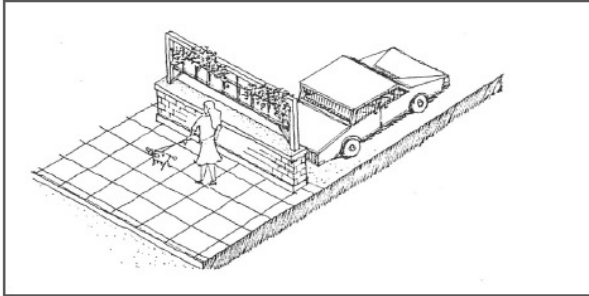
Surface parking screened by an architectural wall and trellis.
